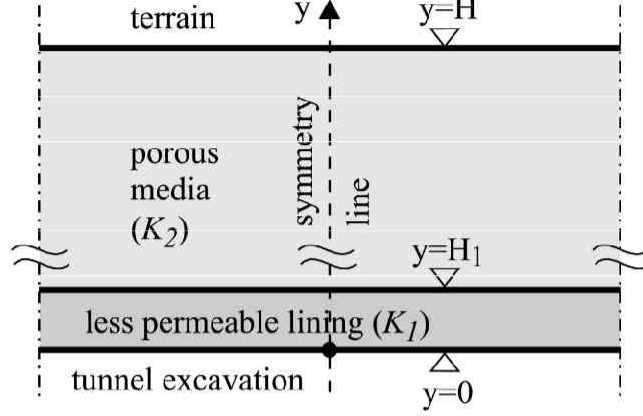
Schematic cross-section of tunnel excavation lined by less permeable material
